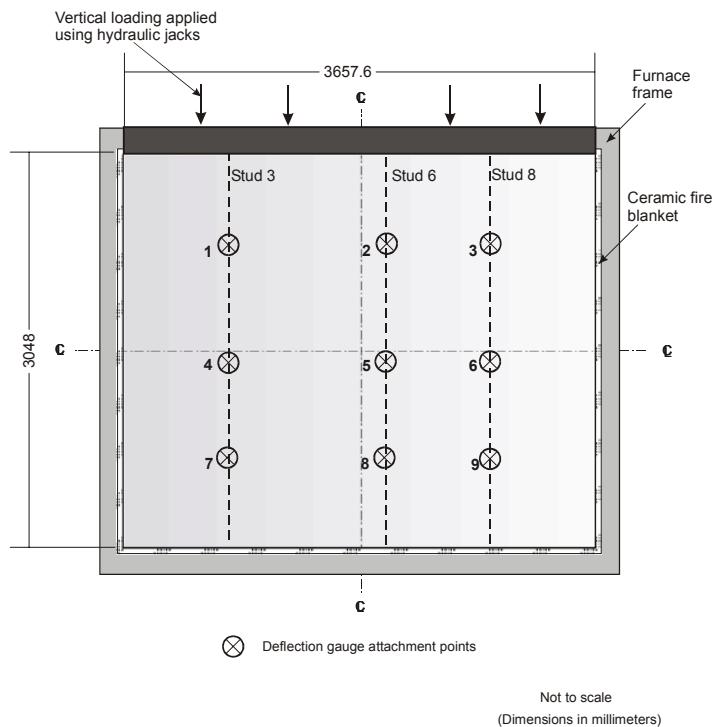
Deflection measurement points for full-scale wood stud loaded wall assemblies.
